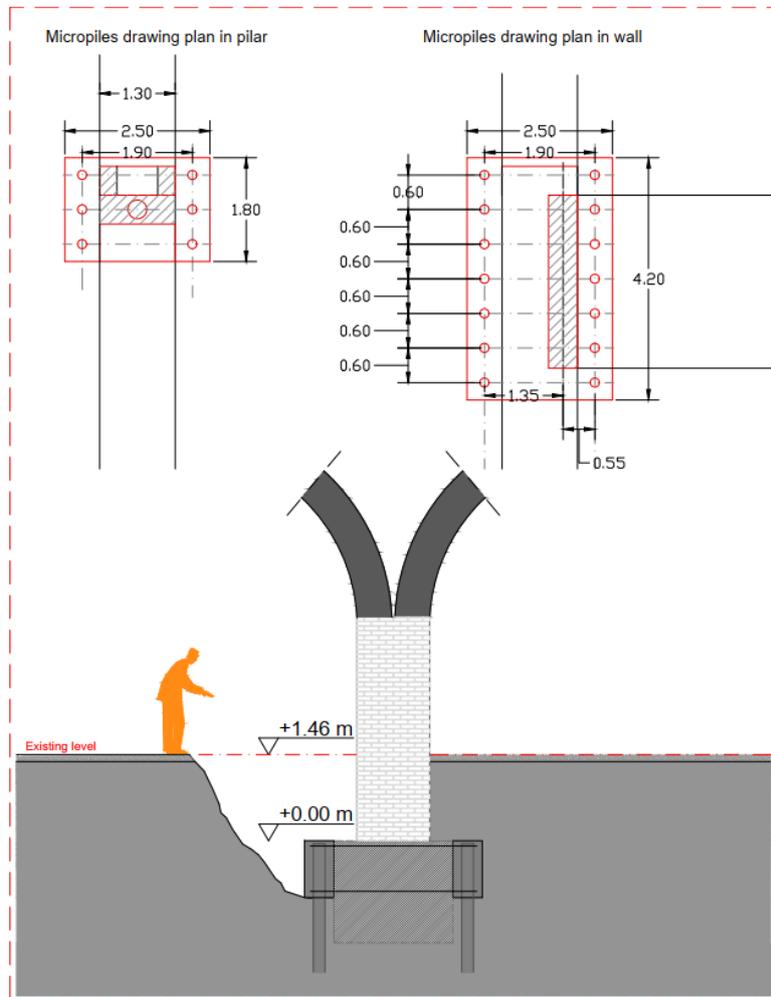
Elevation drawing of excavation up to base of pile cap. Plan drawing of two types of foundations.
